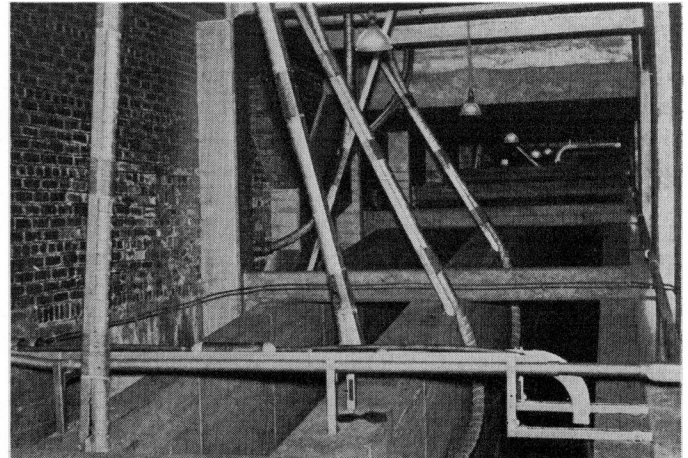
Structural steel channel used as vertical troughs in cable subway, Station A, San Francisco
